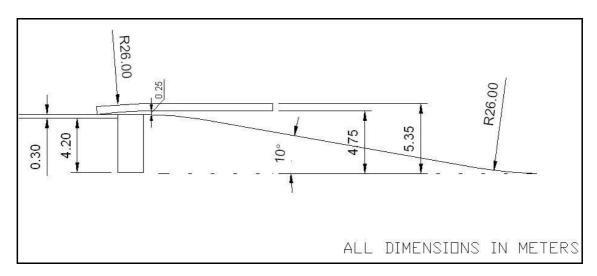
Side View Crossing Junction Switch Incoming Rails Dimensions #1
